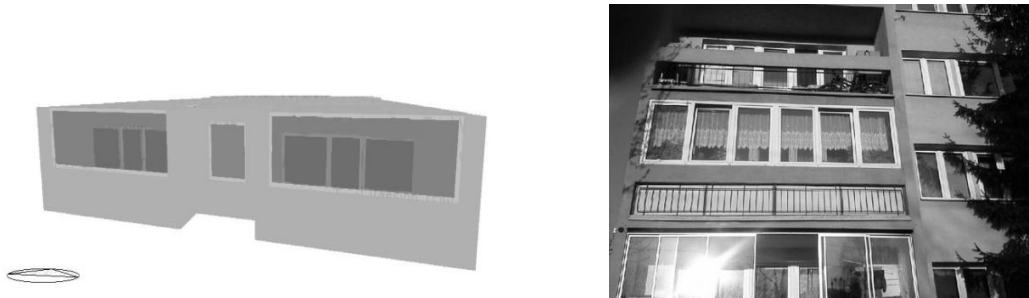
Model visualization of balcony loggia framing at south elevation of building.
